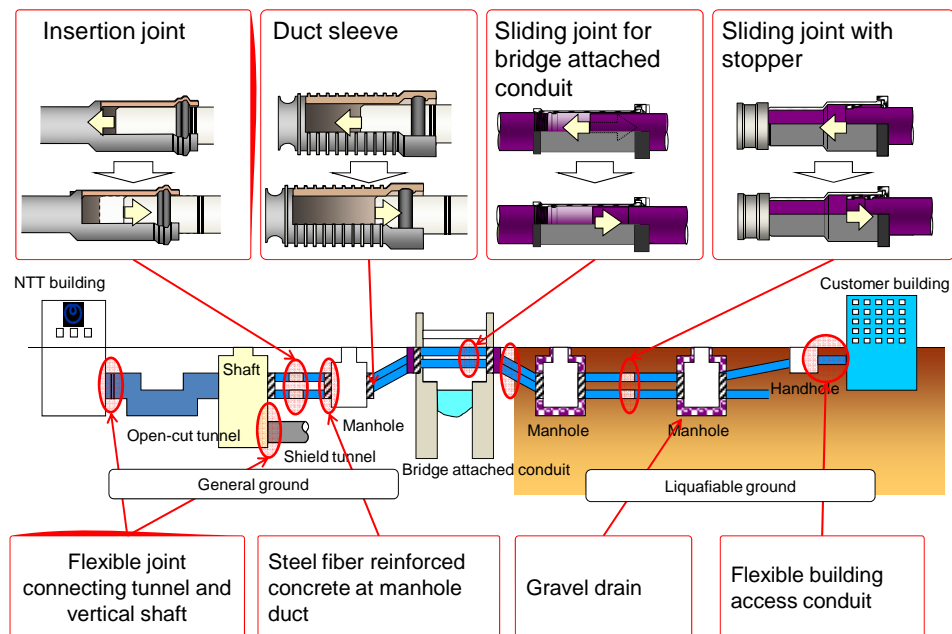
Examples of Earthquake-proofing measures for Underground Facilities
